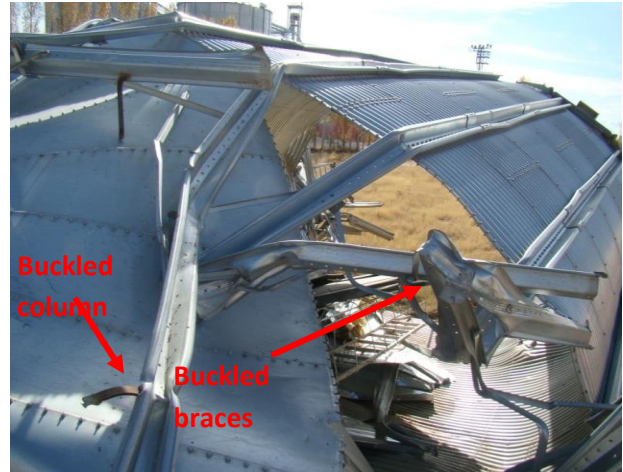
Damaged Silo type "A". Buckling of the cold formed column and braces are shown.
